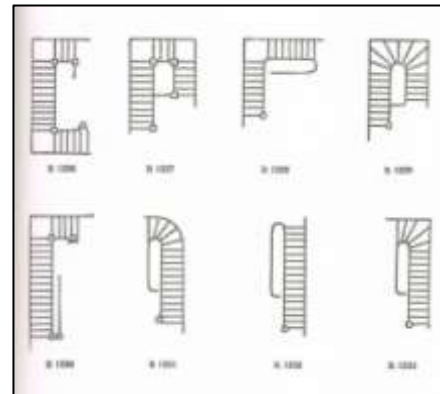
Stair plans in the Roberts Catalog. Note the similarity of shape between design R 1227 and the farmhouse staircase, suggesting it was locally designed.
